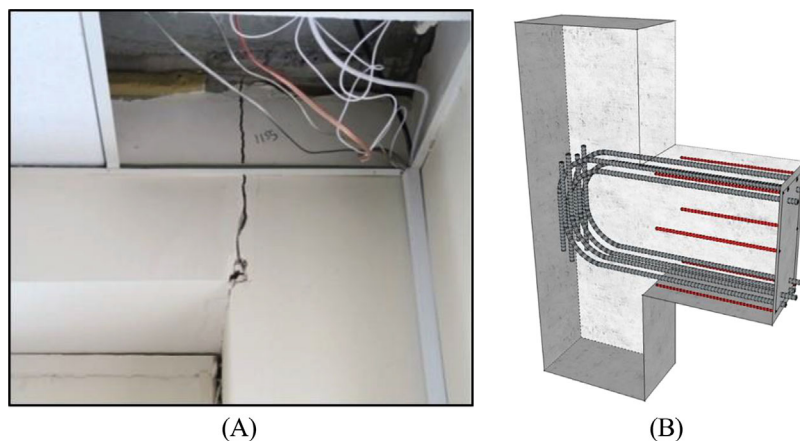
(A) Observed damage following the 2016 Kaikoura earthquake (Photo by Synge A) (B) Bar curtailment detailing close to the column face (NB:—Curtailed bars are in red colour).
